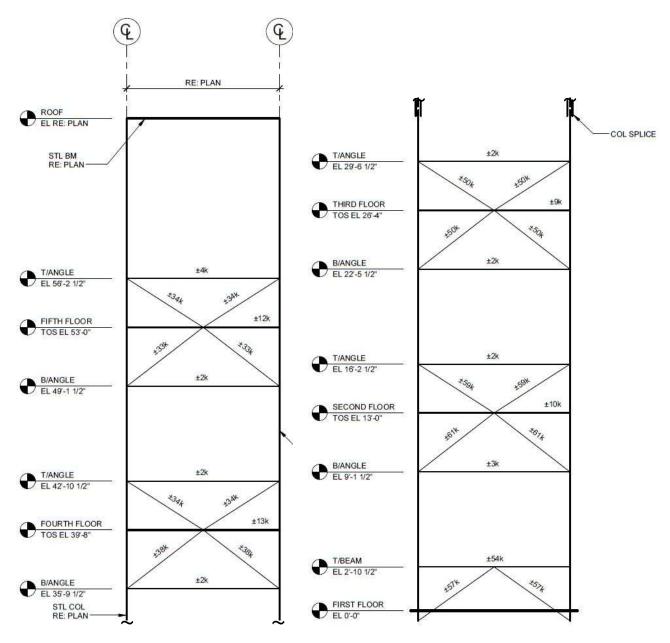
Typical Braced Frame and Bracing Details (Image Credit: Larson Design Group)
